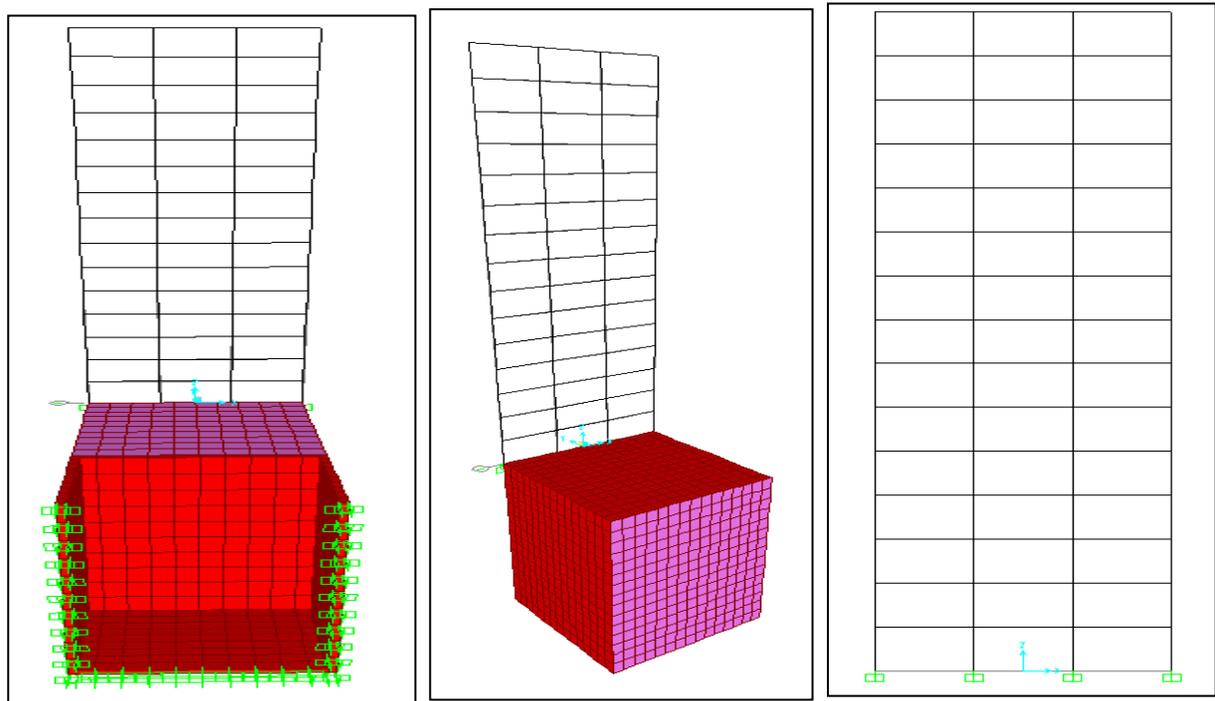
Model of 15-story building before and after excavation and with rigid base (no SSI)
